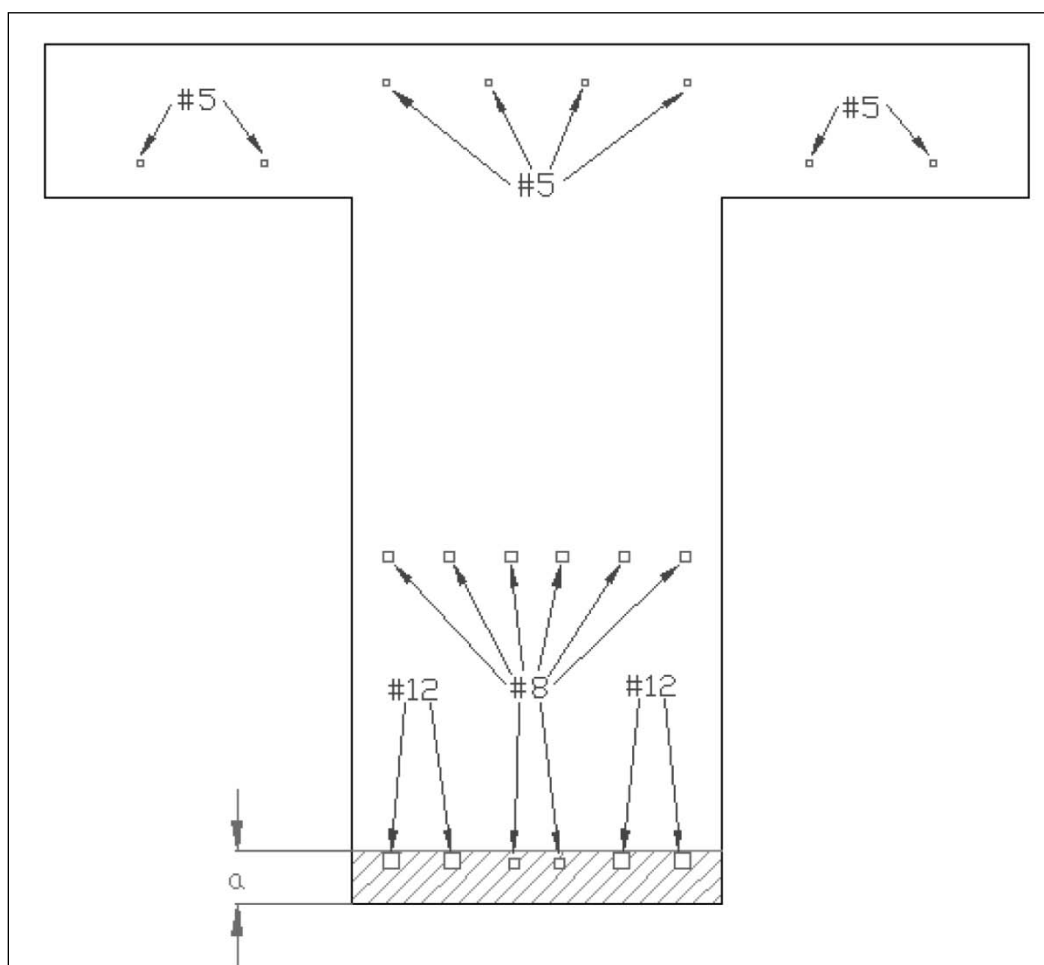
Cross section of the interior beam at end-span with the steel rebar size.
